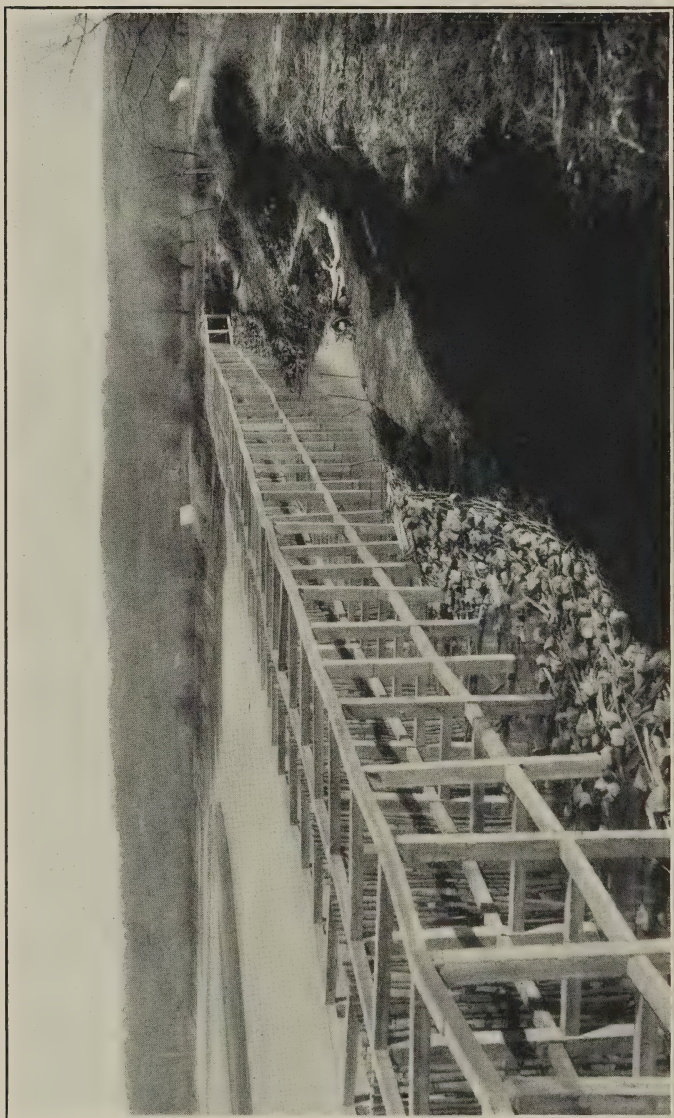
Concrete dike, 500 feet, at Bonton Bend, St. Joseph, Mo.
